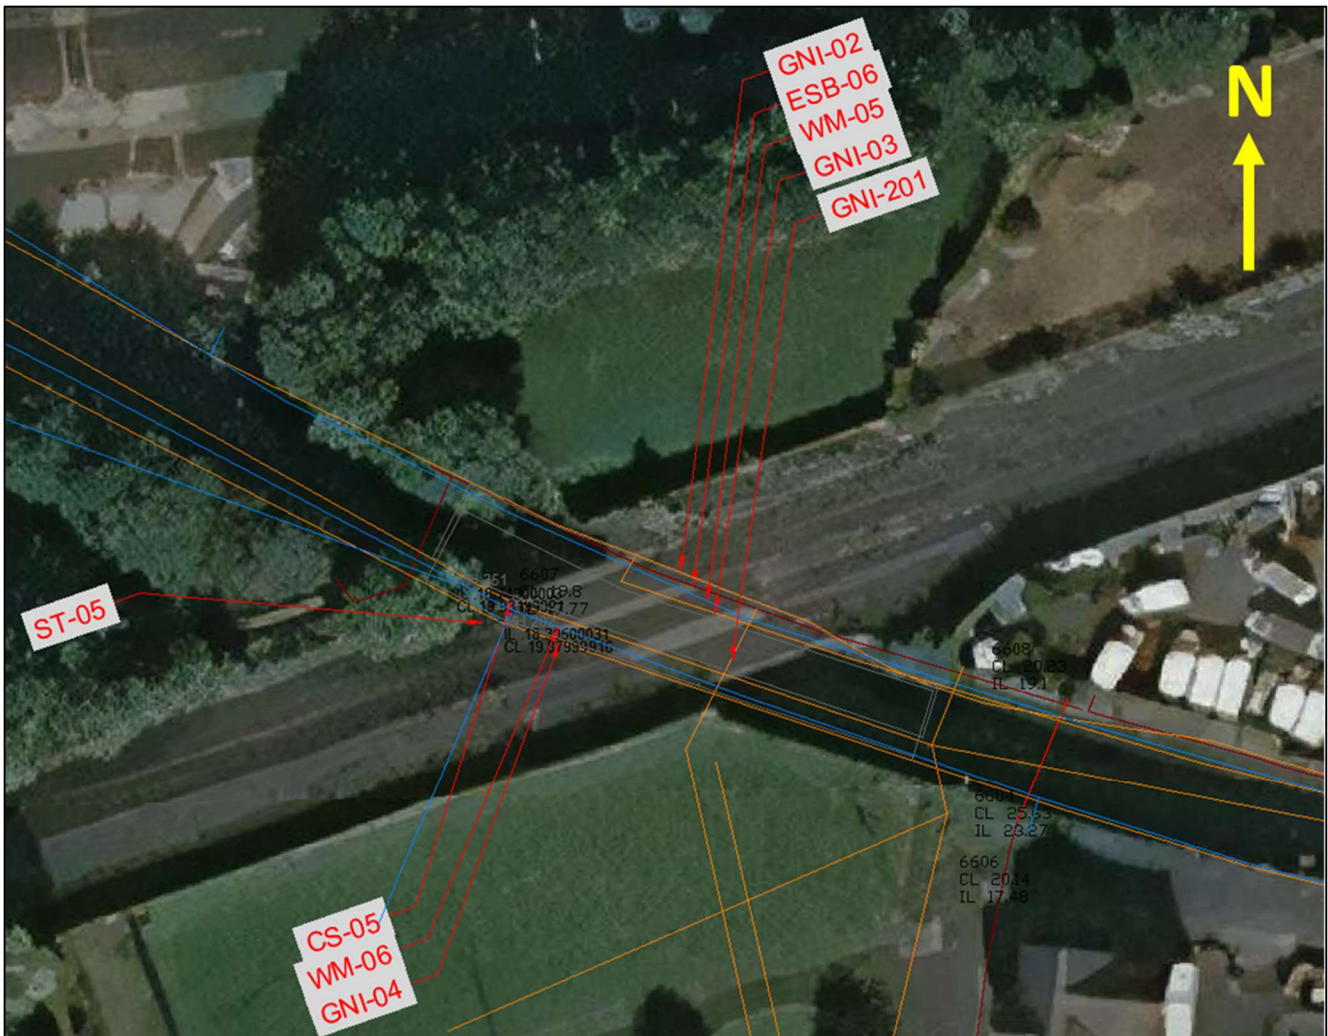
Existing Utilities at Sarsfield Road Bridge (OBC3)
